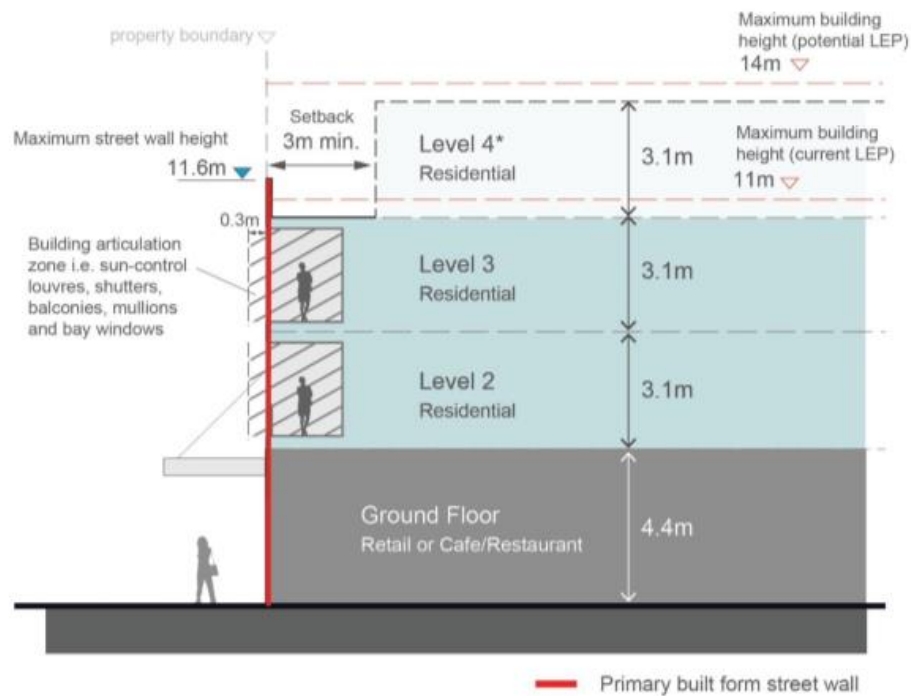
Typical 3 storey street wall section predominant within the 'Westend' and 'Surf Beach' Precincts
